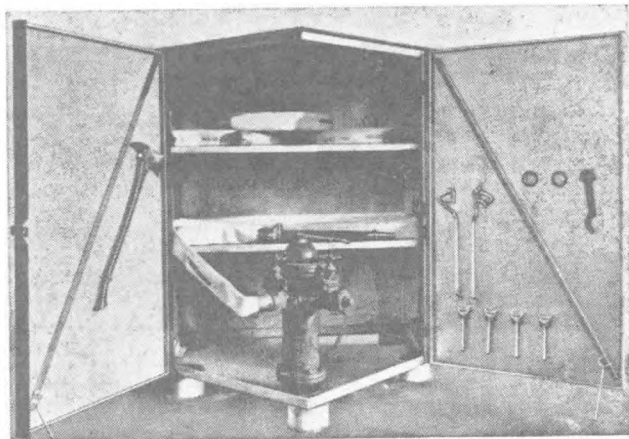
House of five-sided design for installation over a yard hydrant. Such houses may be of wood, steel, or aluminum with a tight floor installed after erection.
